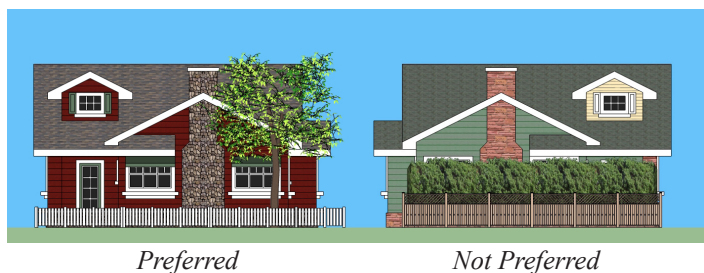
Landscaping should enhance and frame the building frontage (left), not obstruct it (right).
